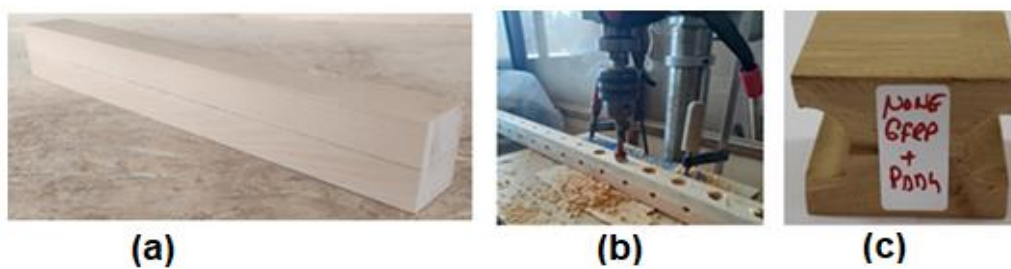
Manufacturing process for experimental samples: a) Slats, b) Hole drilling process, c) Test samples
